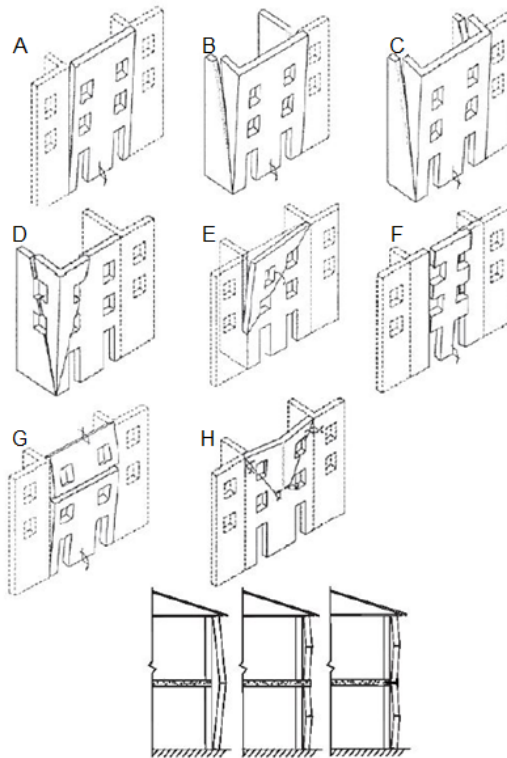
OUT-OF-PLANE FAILURE MECHANISMS (A) VERTICAL OVERTURNING (B) OVERTURNING WITH 1 SIDE WING (C) OVERTURNING WITH 2 SIDE WINGS (D) CORNER FAILURE (E) PARTIAL OVERTURNING (F) VERTICAL STRIP OVERTURNING (G) VERTICAL ARCH (H) HORIZONTAL ARCH (RESTREPO-VELEZ AND MAGENES, 2004; AYALA AND SPERANZA, 2003)
